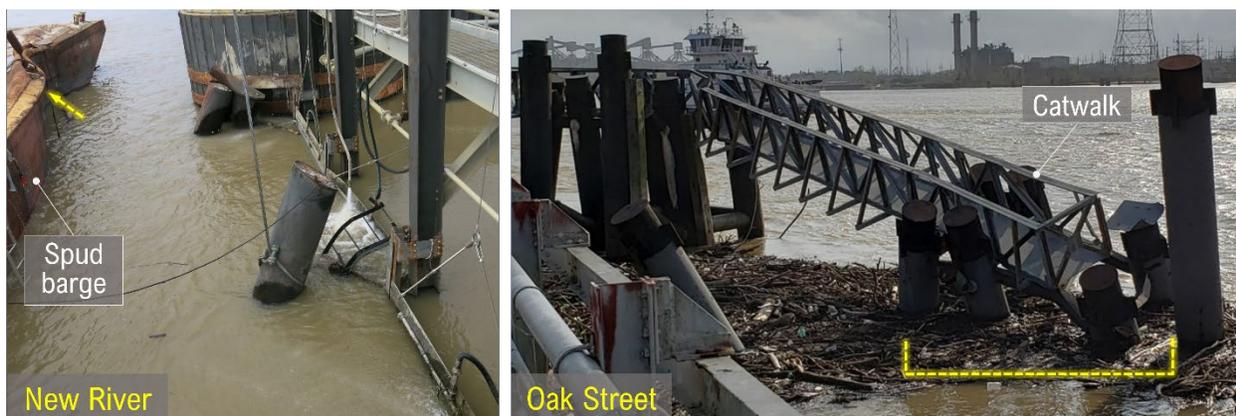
Damage to the river intake fender systems: (left) arrow shows damage to the spud barge at New River; (right) bracket identifies the damaged catwalk and dolphin piles at Oak Street downriver. (Source: Coast Guard [right photo])
